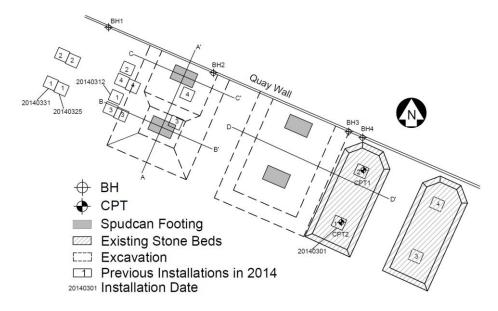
The expected spudcan footprints, excavation area, existing SBs & the location of other jack-ups installed in 2014
